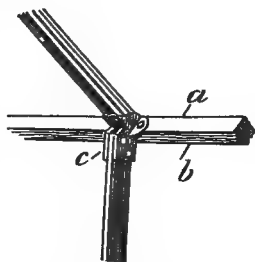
Iron eave plate. Note roof bar and post bracket.
